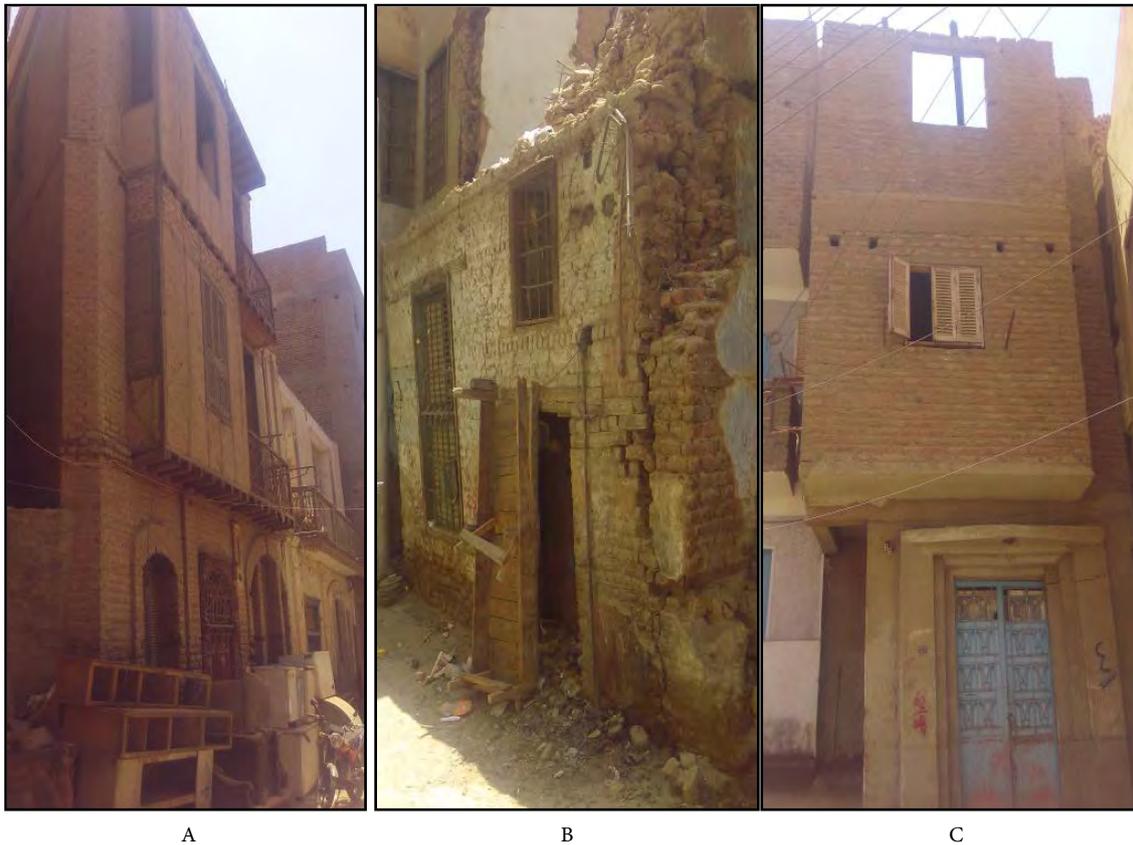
A. Shows the buildings were built by walls and concert roofs. B. Shows the buildings were built by mud bricks. C. Shows the buildings were built by walls and wooden roofs.
